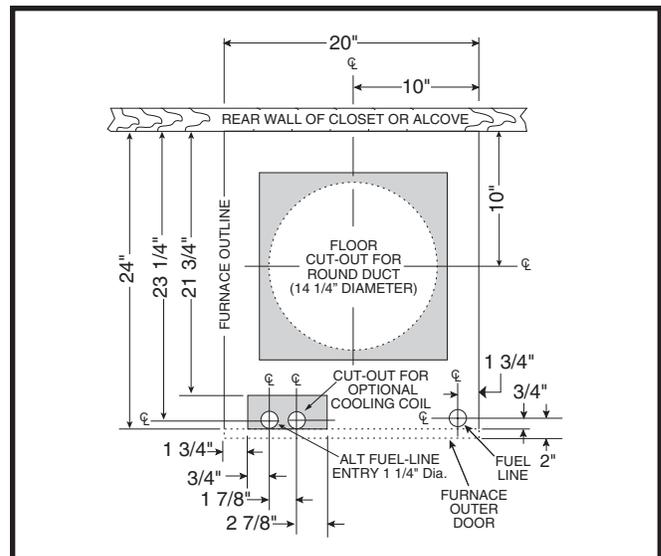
Cut-Out Dimensions for Round Duct Connectors
